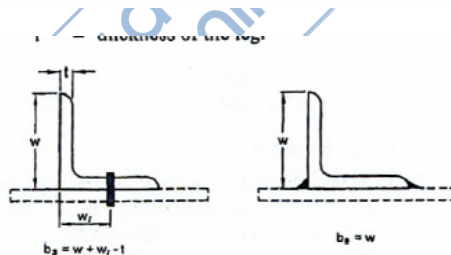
ANGLES WITH SINGLE LEG CONNECTIONS
